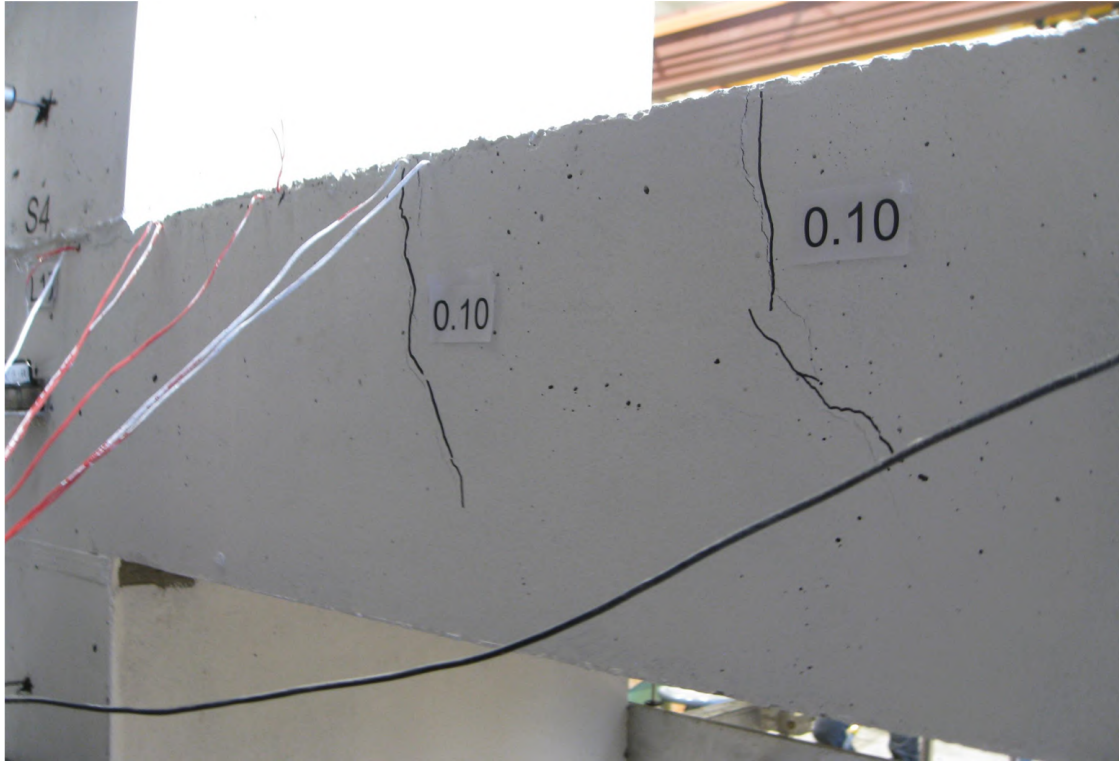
Specimen 4 free edge face cracks at $V = 186.0$ kN (west side)
